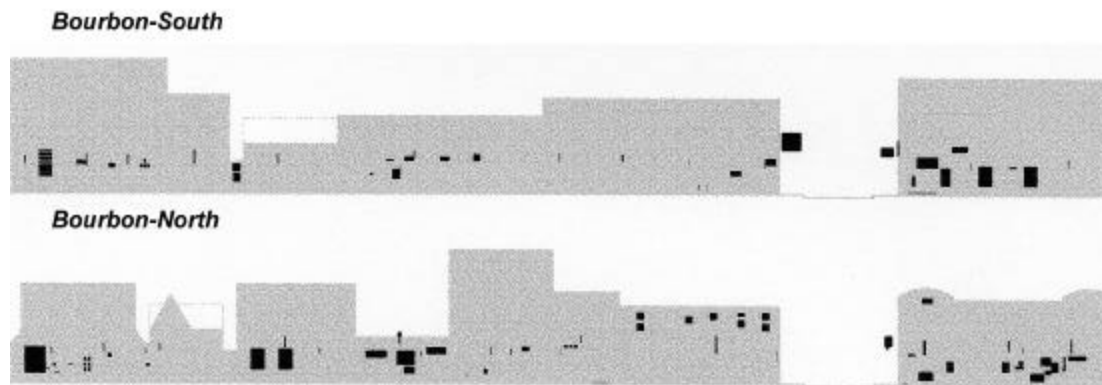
Elevations of buildings and signs for the Bourbon site.
